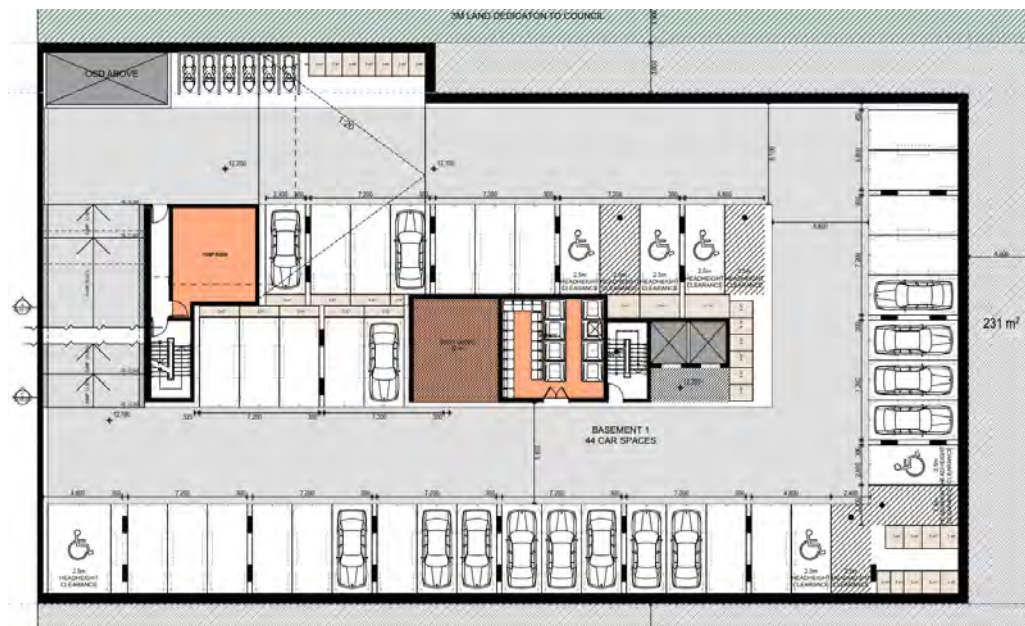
Approved DA2016/170/2 basement 01 plan showing 44 car parking spaces.
